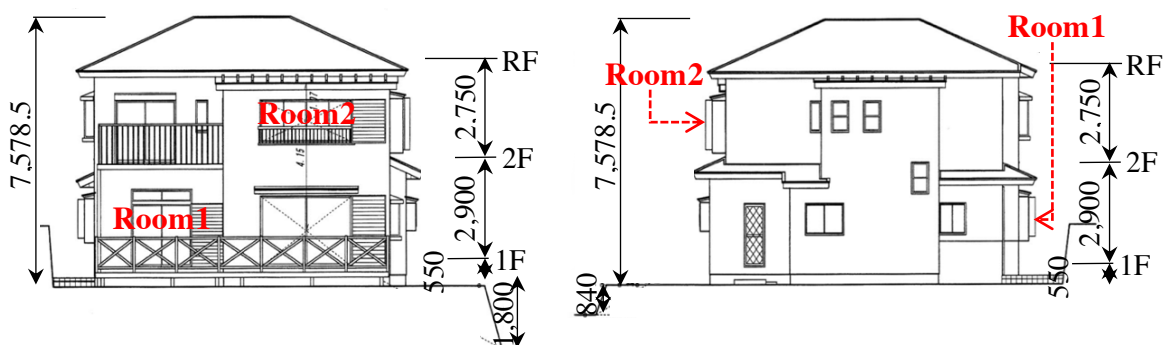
Completion figures for the south-side elevation (left) and for the north-side elevation (right)
